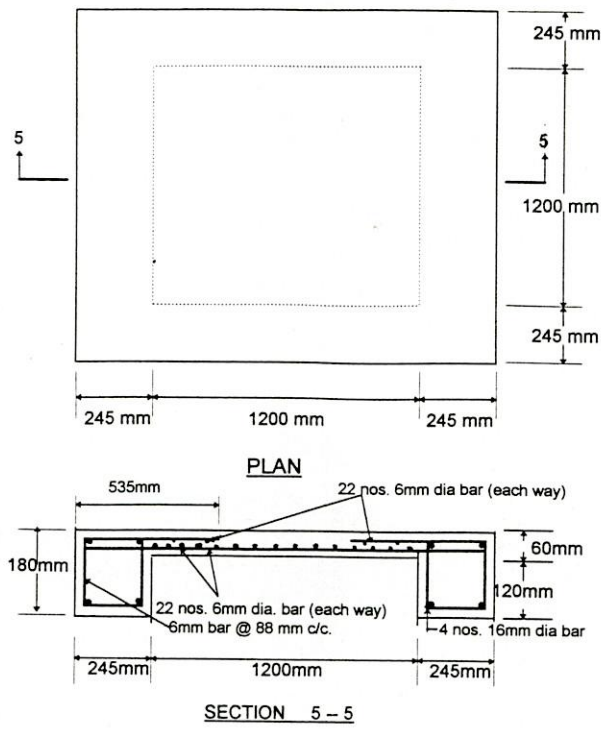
(a) Plan (b) Section and reinforcement details of SLAB5
